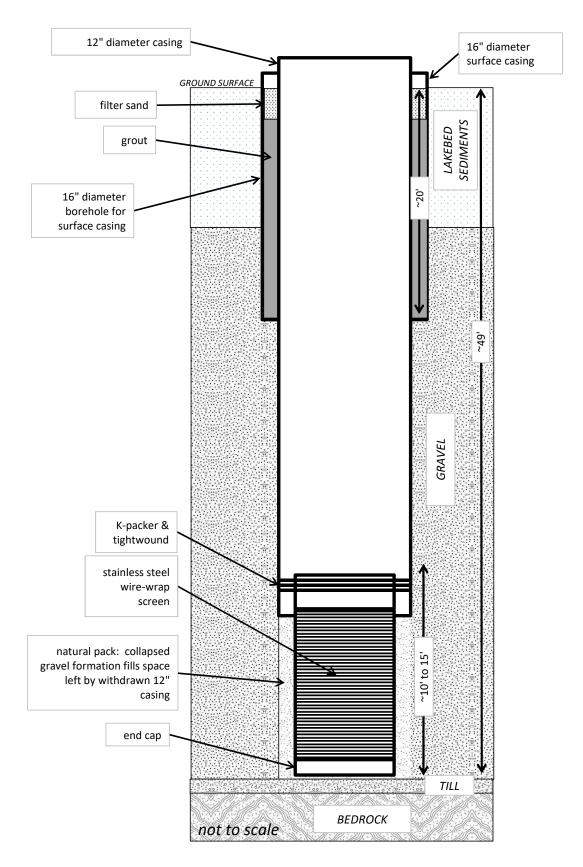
Proposed Preliminary Well Design and Schematic Construction Diagram
